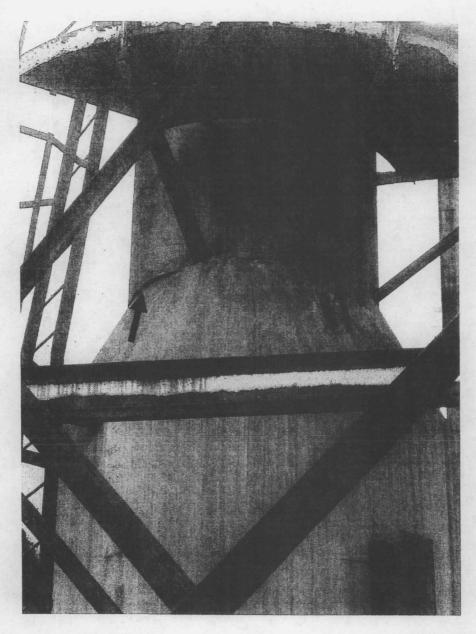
Looking south at metal failure between stack and base on Center Stack
